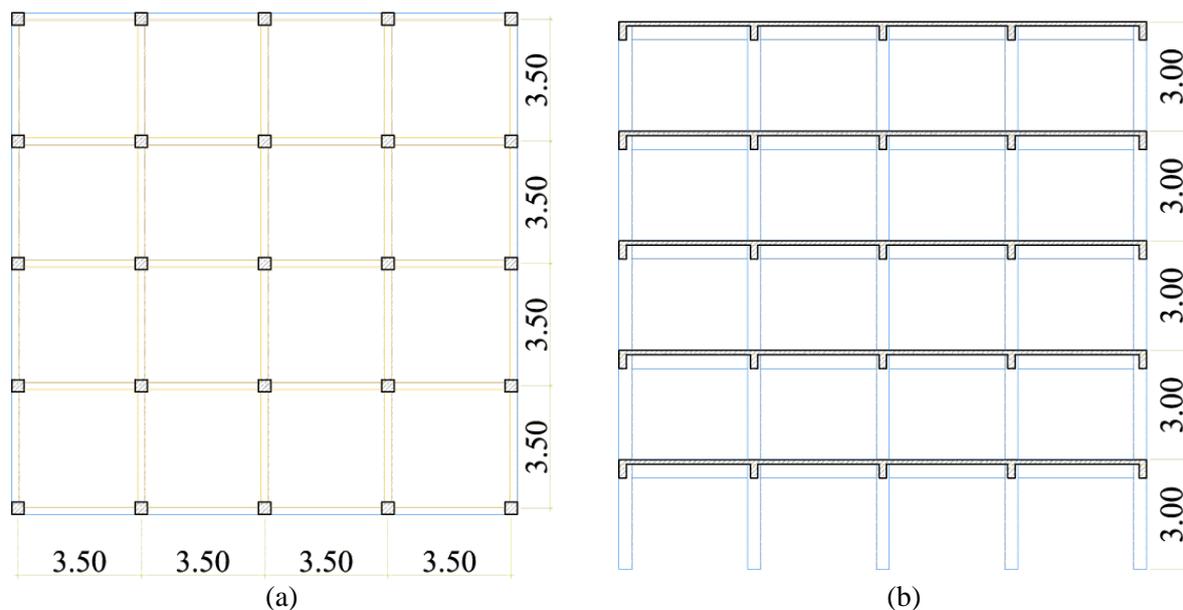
(a) Plan and (b) elevation of the RC building (dimensions in meters)
